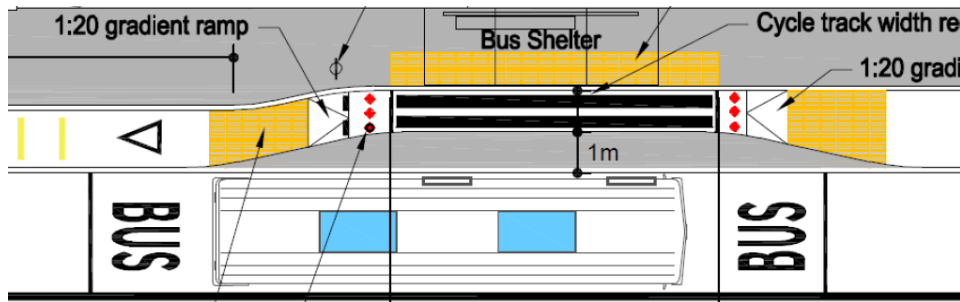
Alternative Shelter Location Back of Footway (Narrow Island with Adequate Footway Widths)
